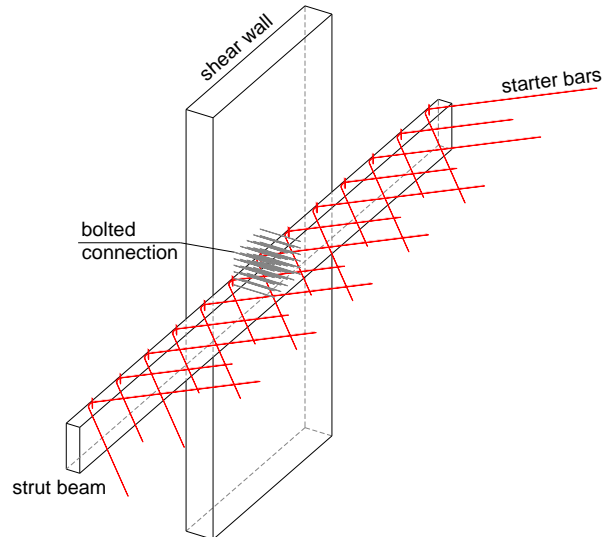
Conceptual connection of the diaphragm to the timber strut beam and its connection to the wall
